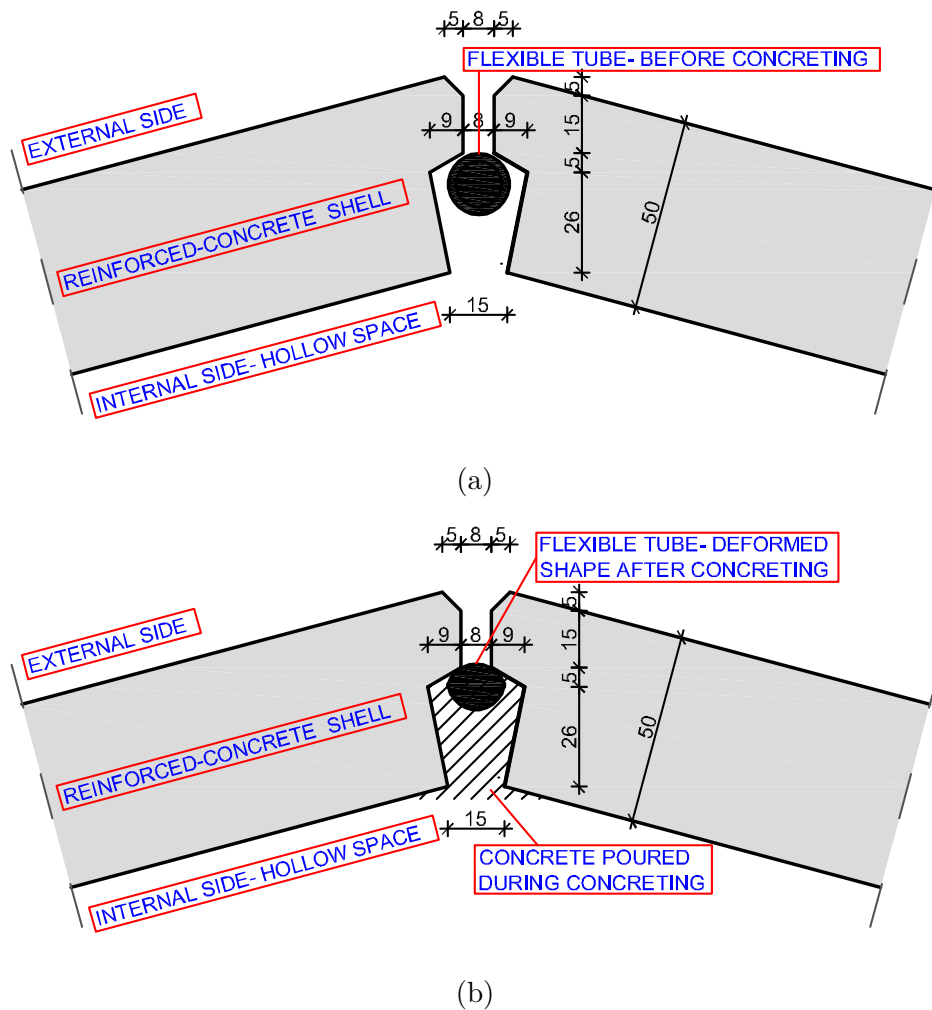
Flexible tubes as sealing for external vertical joints; (a) initial position of the pipe before concreting; and (b) deformed shape of the pipe due to concreting [mm]
